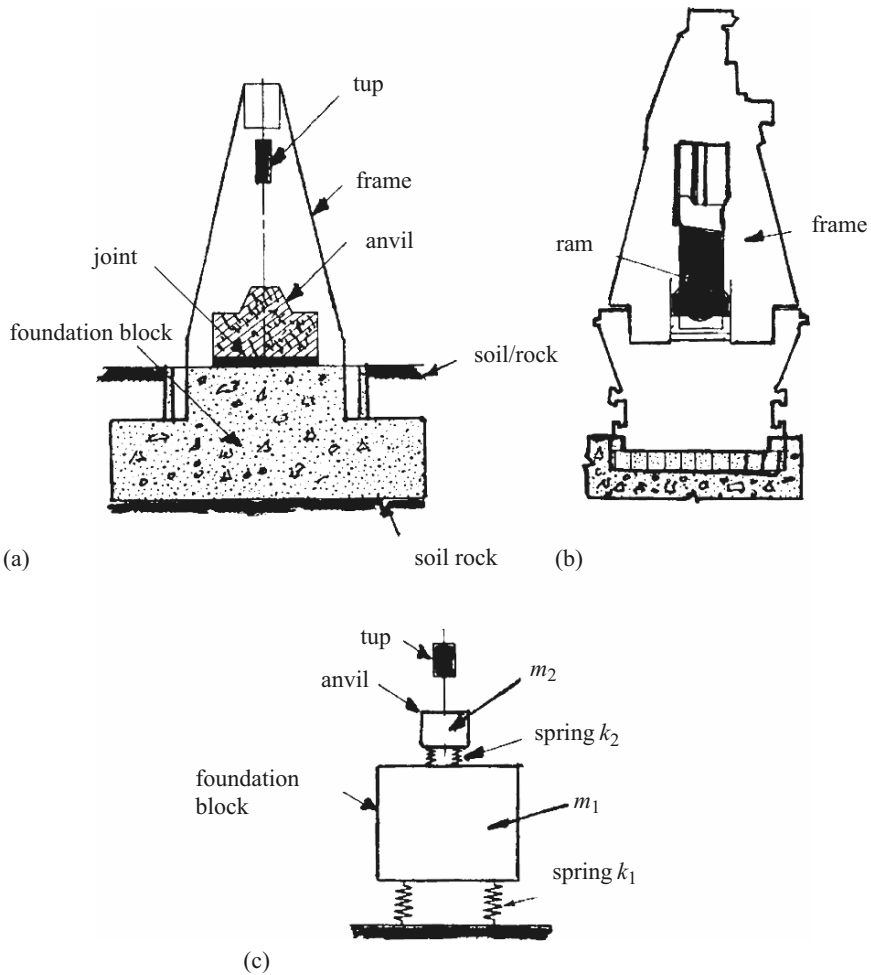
Typical arrangement of a hammer foundation resting on soil with (a) a frame mounted on the foundation; (b) a frame mounted on the anvil; (c) two-mass-spring analogy for a hammer foundation
